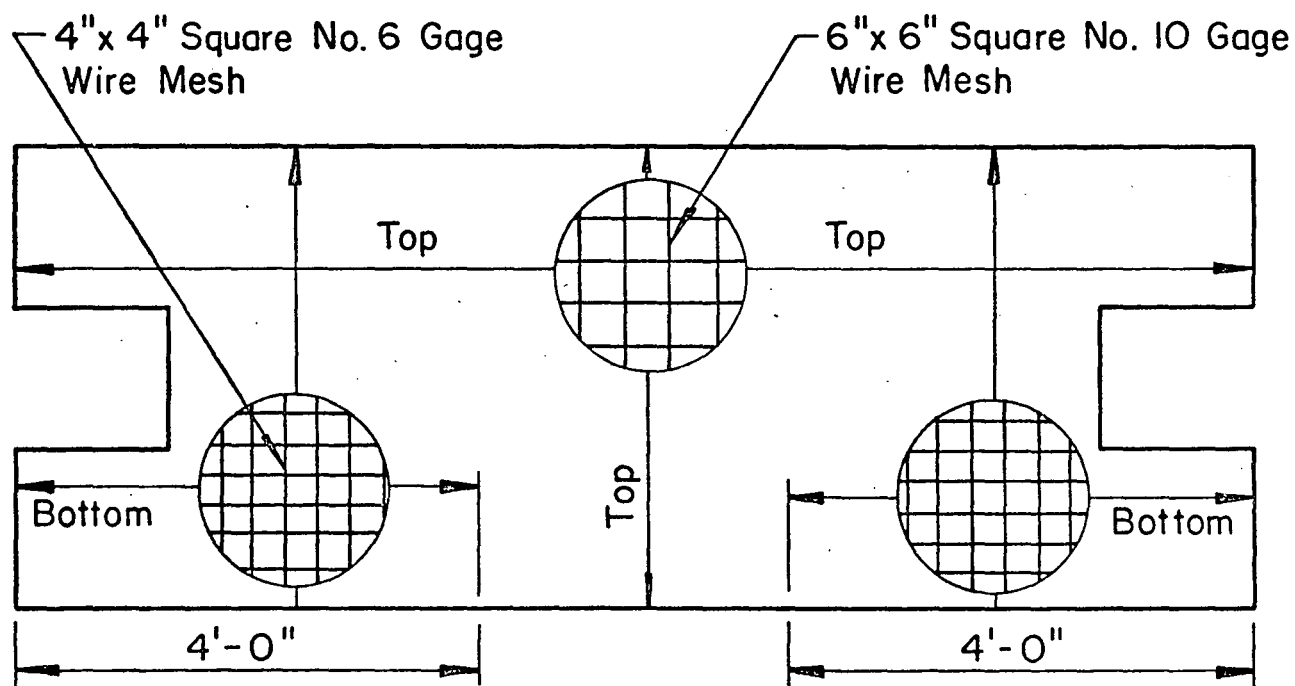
REINFORCEMENT DETAILS FOR BEAMS E & F
